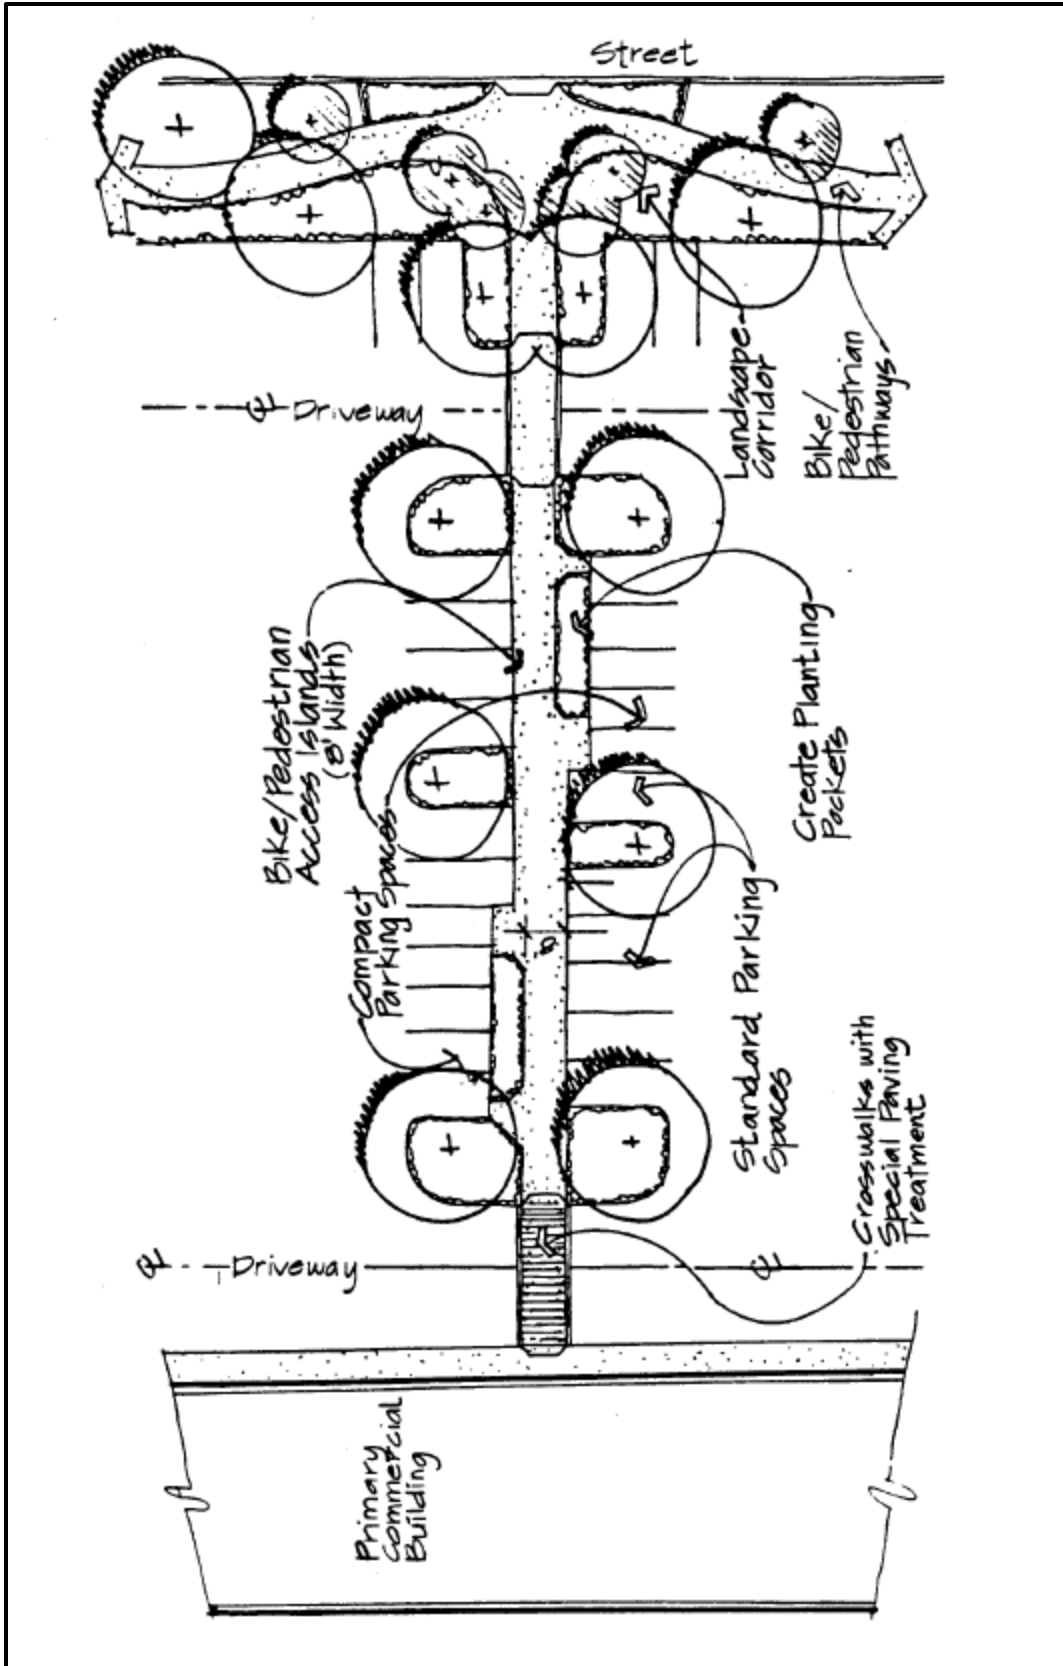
Pedestrian Walkway in Commercial Parking Lot
